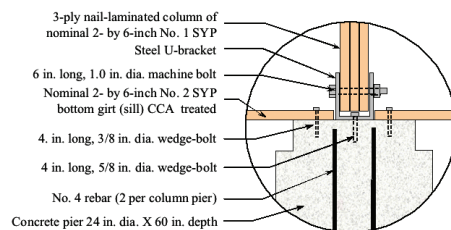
Column-to-foundation and sill attachment details. A single 1-inch diameter bolt was used to pin-connect each nail-laminated column to the foundation. Direct attachment of the bottom girts (sills) to piers enabled direct transfer of wall in-plane shear forces into the foundation.
